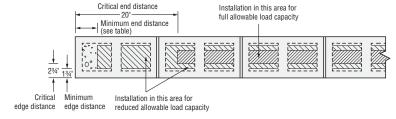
A. Allowable Anchor Locations of ½"- and %"-Diameter Threaded Rod for Full and Reduced Load Capacity When Installation Is in the Top of Fully Grouted CMU Masonry Wall Construction
